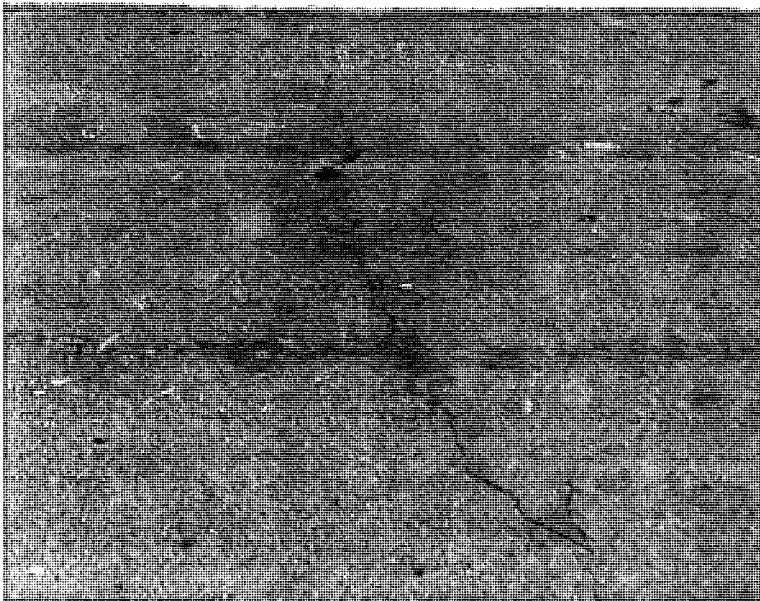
A typical tight mid-slab crack on CSN# 19042-02233A (Section C) EB the crack propagates from the shoulder into the truck lane.
